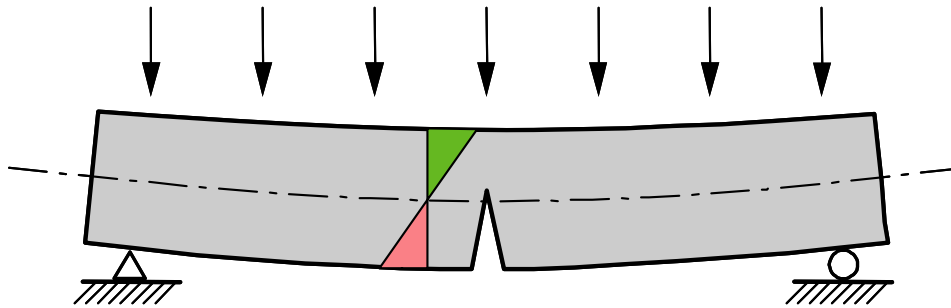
Plain, Unreinforced Concrete Beam in Flexure
